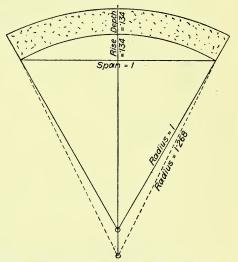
Arch formed in Coke-Breeze Concrete.
